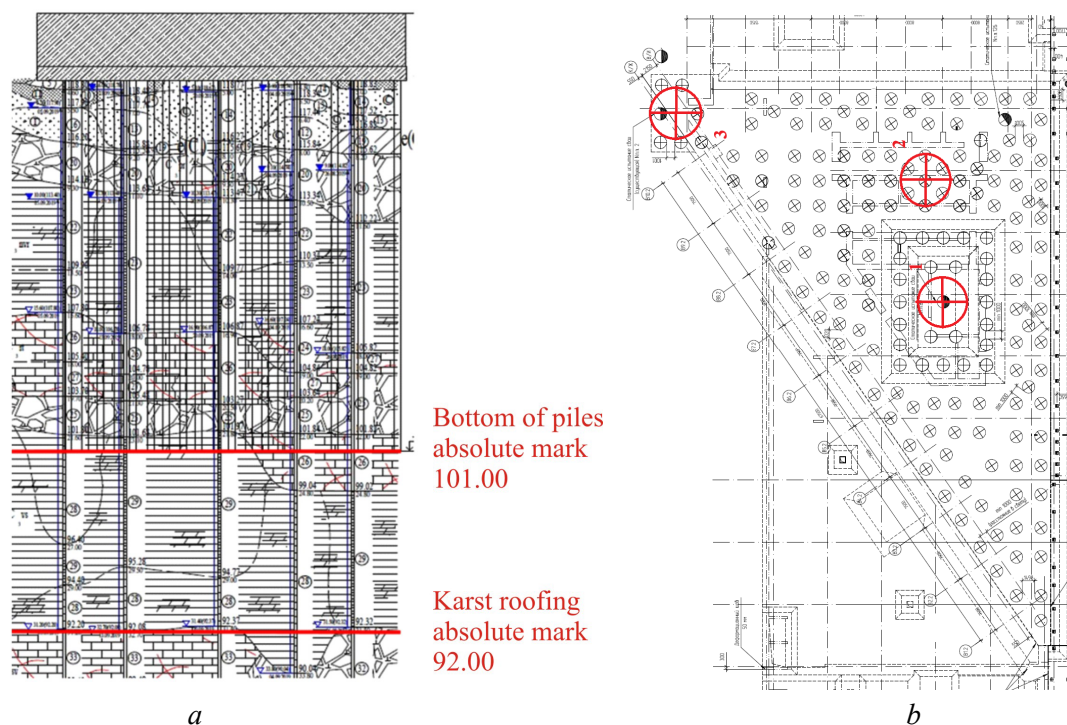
High-rise block No. 9: *a* – basic section of the foundations; *b* – foundation plan of the calculated and indicated karst cavities (variants 1, 2, 3) with a diameter of 4.0 m (absolute elevation 95.00) and 7.0 m (absolute elevation 85.00)
